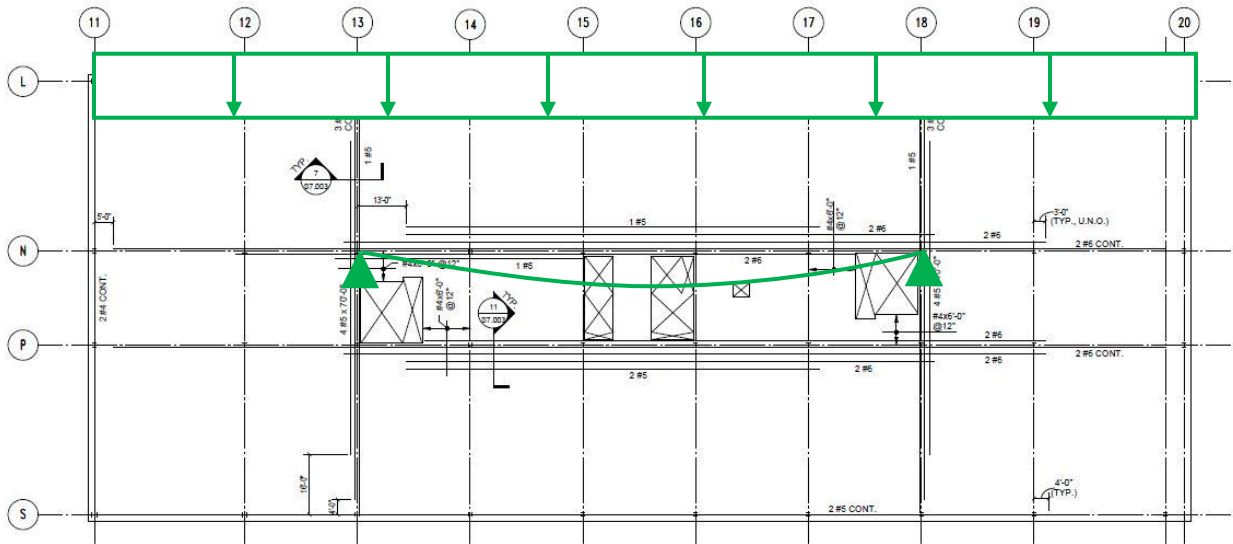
Floor Diaphragm Acting as a Beam Spanning Between Braced Frames
